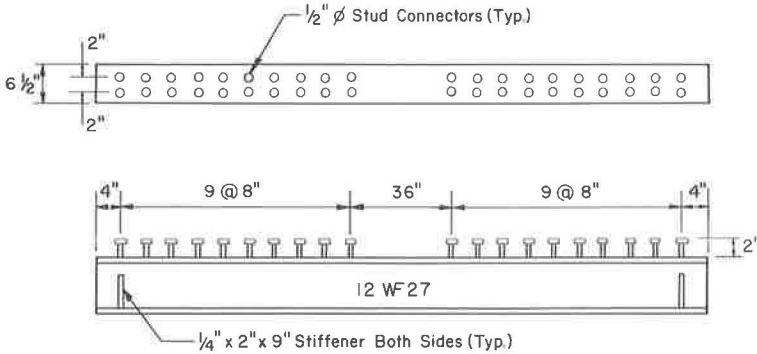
Stud shear connector arrangement for BF-1 through BF-8.
